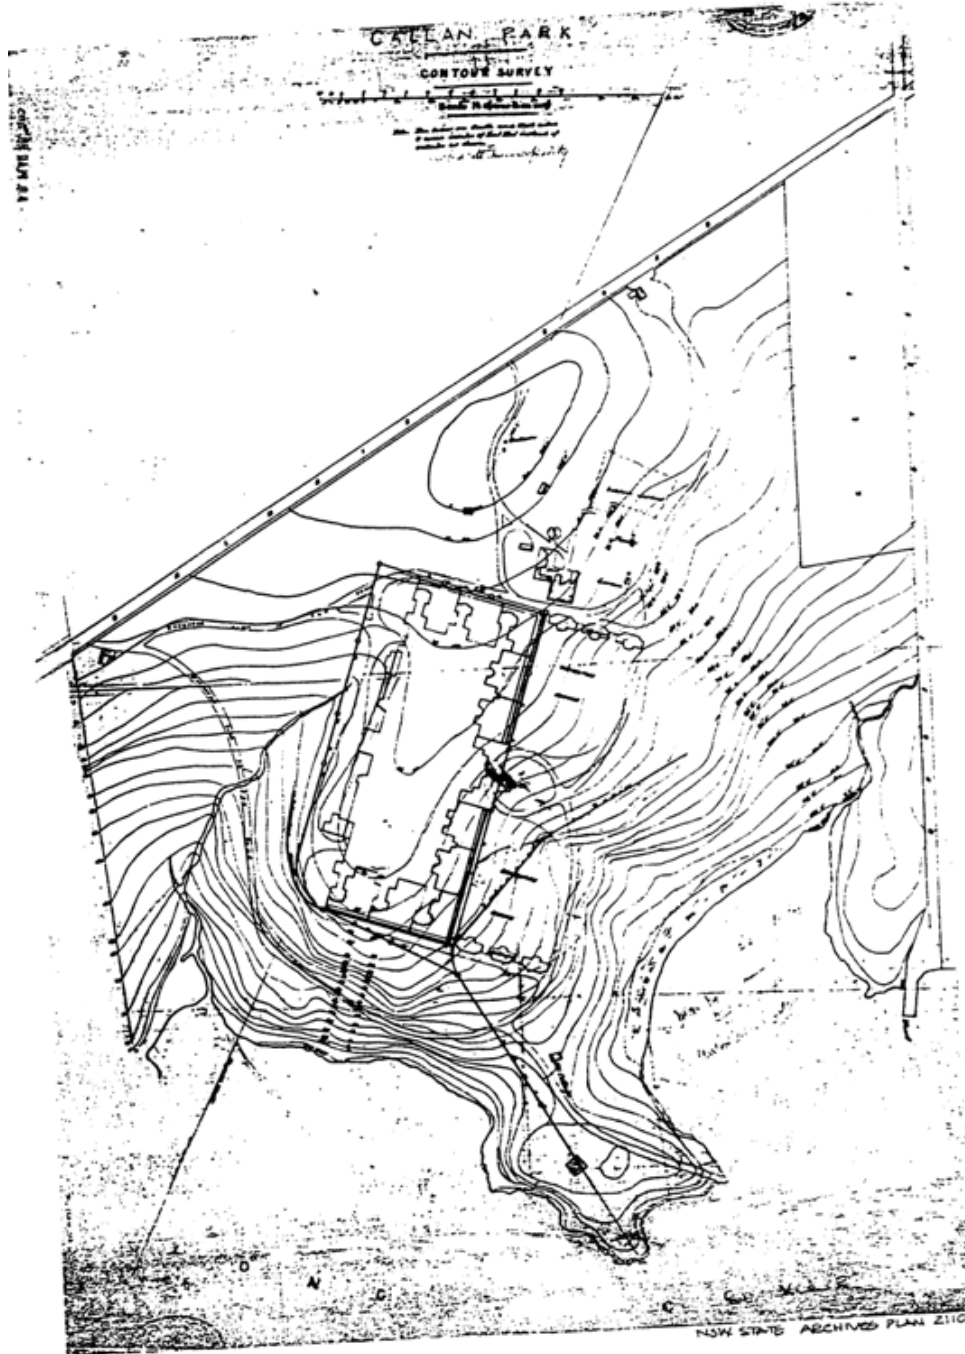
Callan Park Asylum - as proposed – 1877. The layout differs from the 1893 as-built plan
